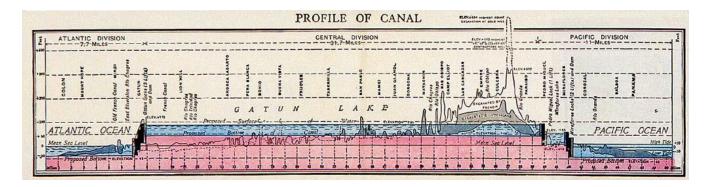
Elevation cut of the Panama Canal, showing the mountainous areas excavated by the French and the Americans.
